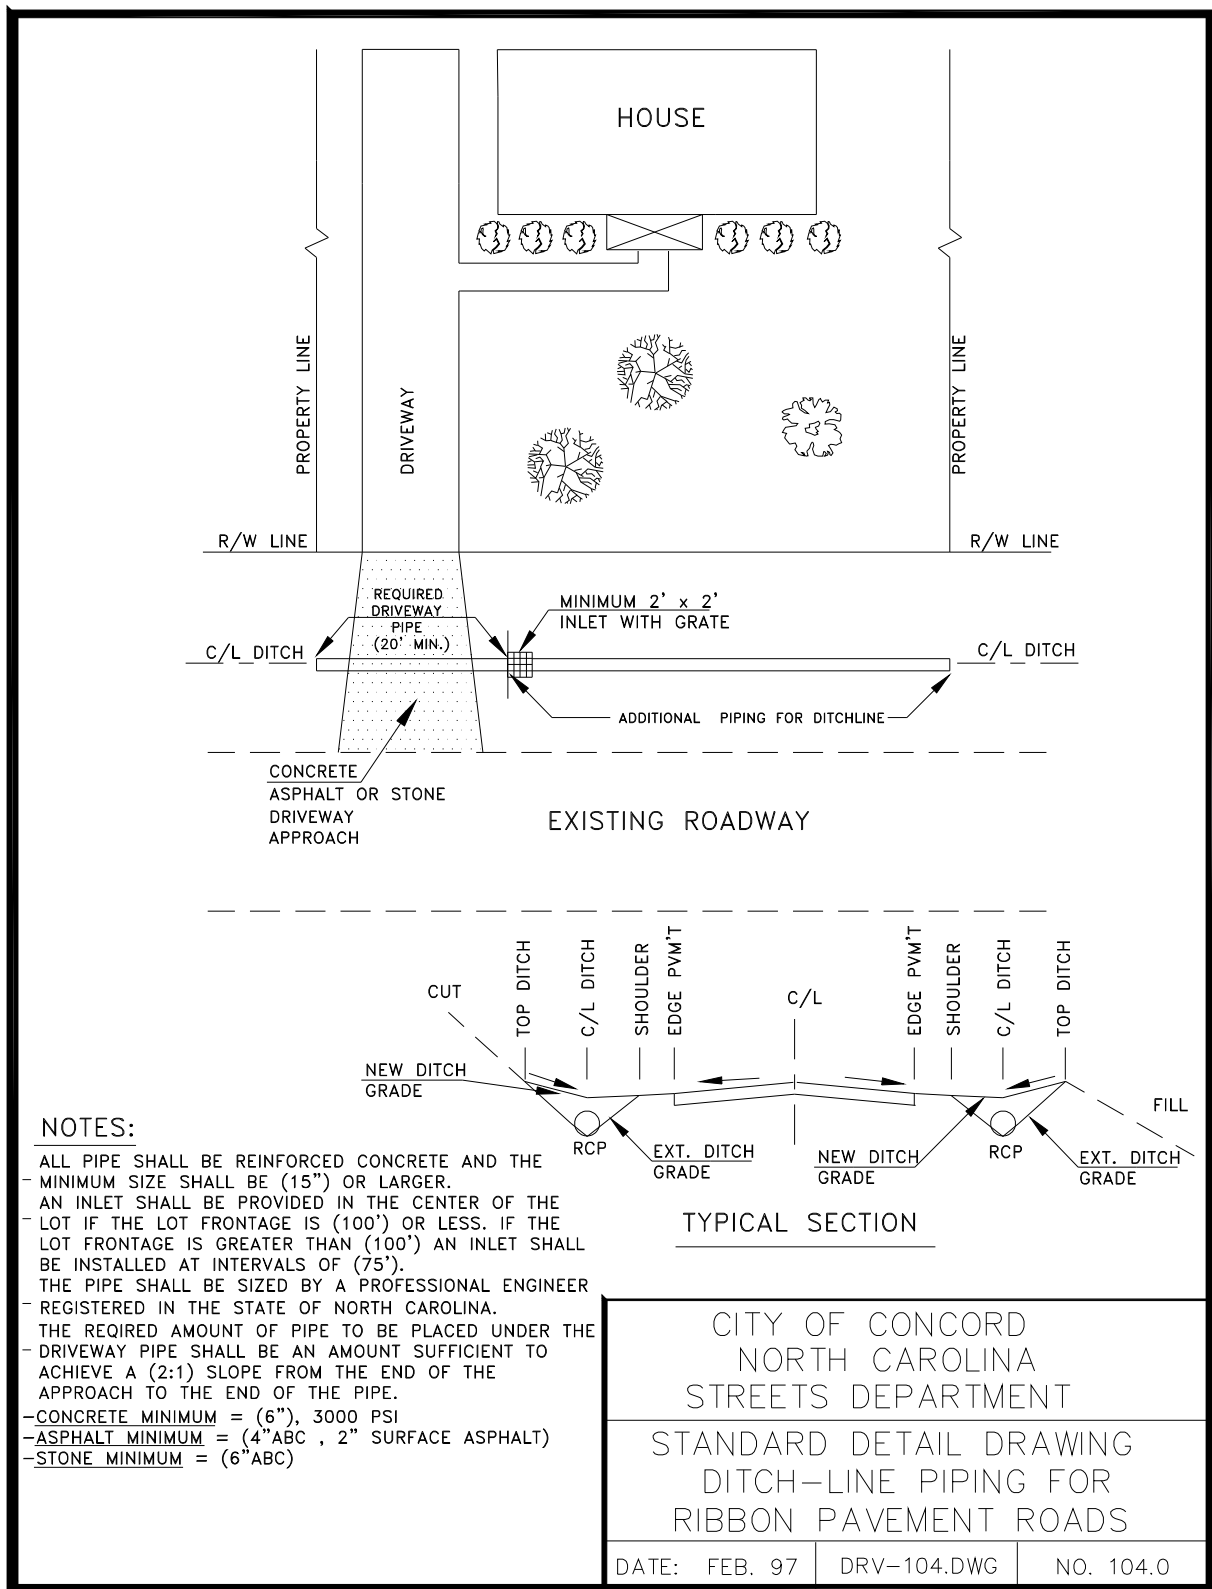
Ditch Piping for Ribbon Pavement Streets.
